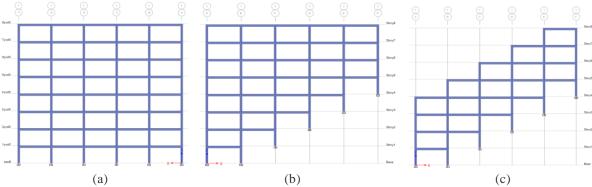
Different configuration of building (a) Regular building on levelled ground (b)Stepback building (c)Stepback-setback building
